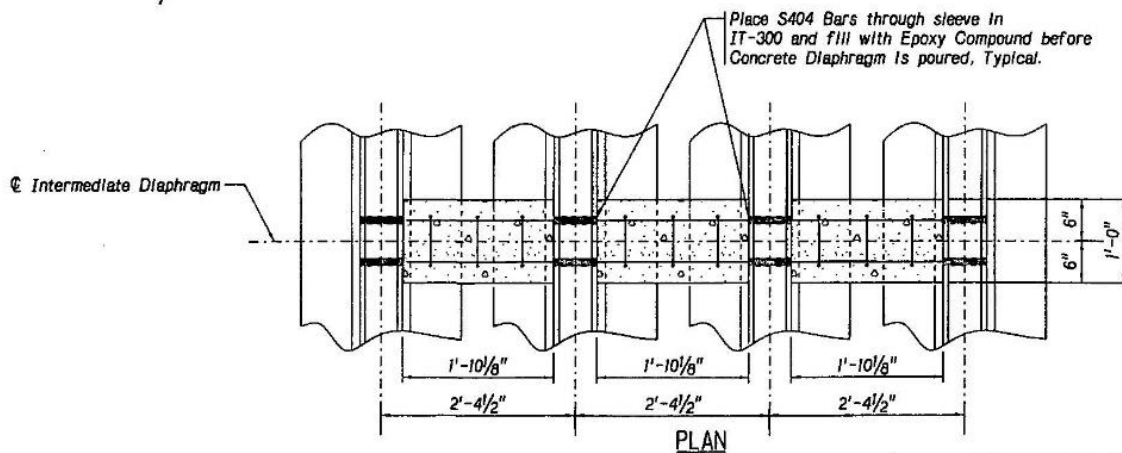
Intermediate diaphragm linking the four exterior girders at midspan for bridge S089 06047.
